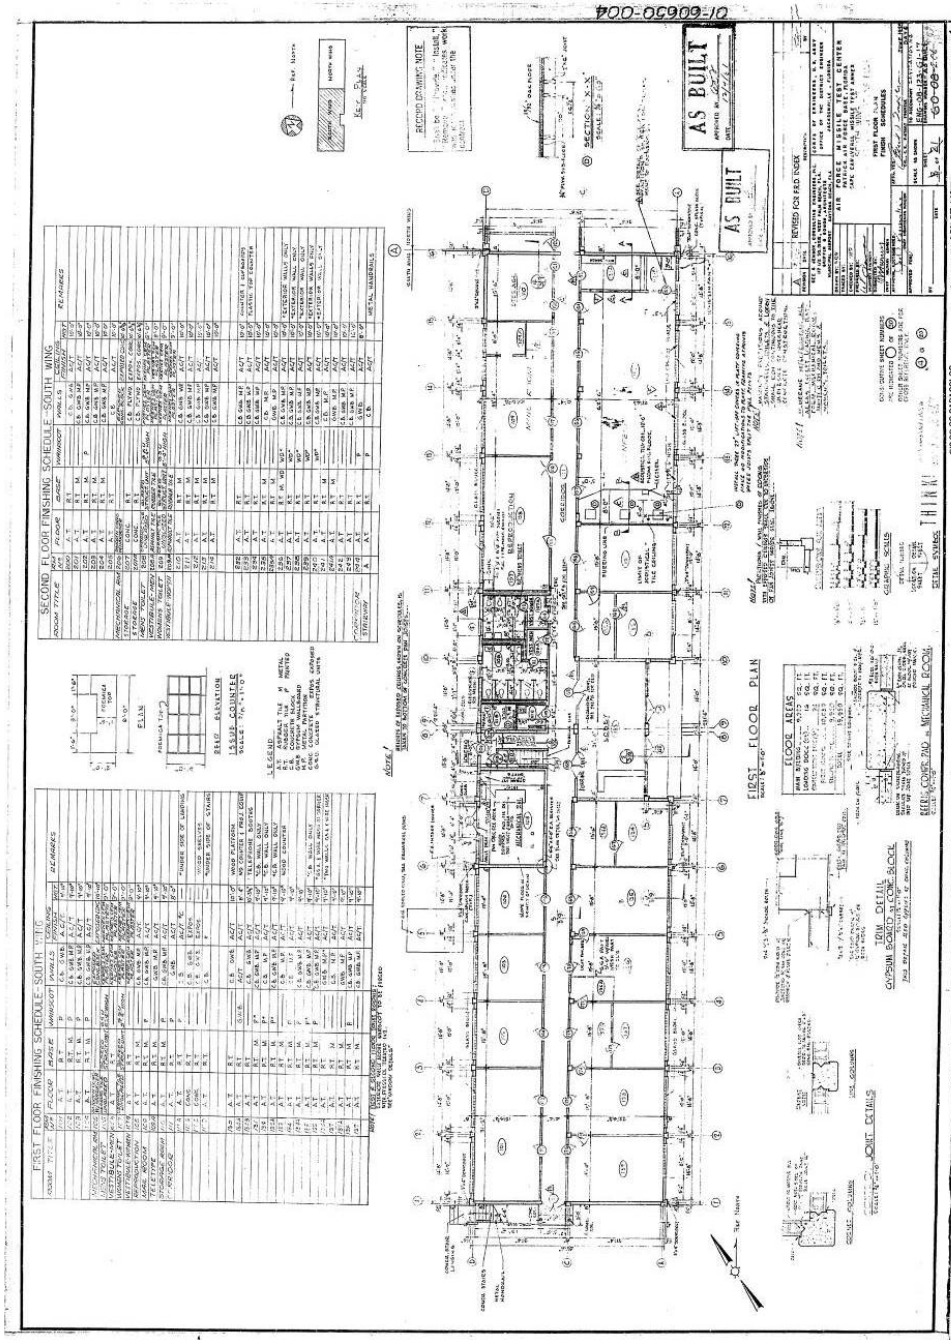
Griffin & Gomon, South Wing of the Engineering & Operations Building, First Floor Plan/Finish Schedules, June 1958, Sheet 4.
